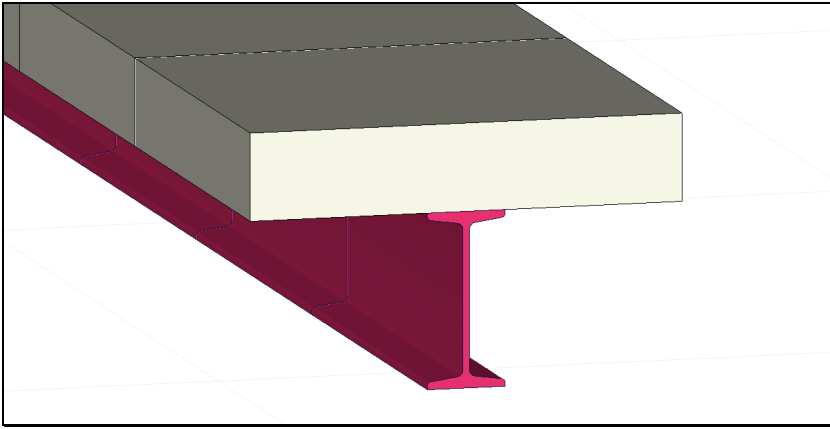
Numerical example 1: composite beam (steel girder + concrete slab).
